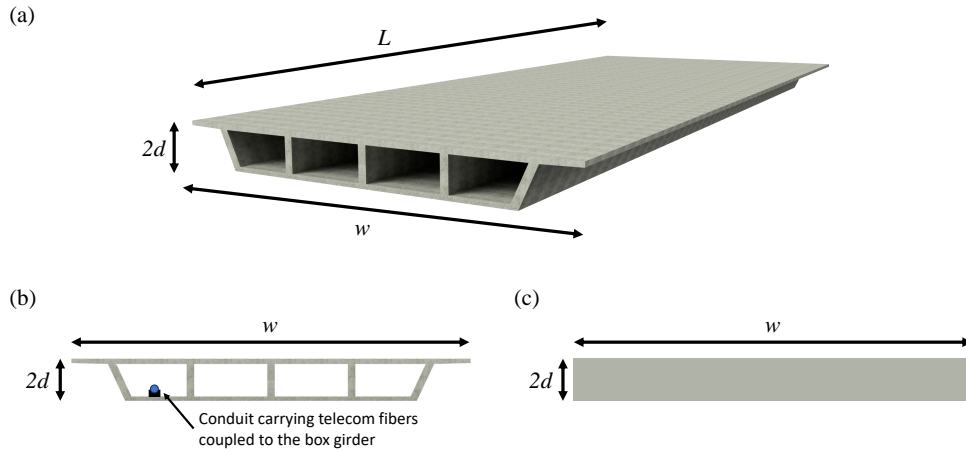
The box girder as a plate. (a) and (b) show a three-dimensional view and cross-section of a box girder. (c) illustrates the cross-section of the simplified beam model, where the box girder is approximated as a thin plate. (b) also shows the conduit carrying telecom fibers coupled to the box girder, representing the setup of tested Bridge 2 in this study, with details provided in Section 5.
